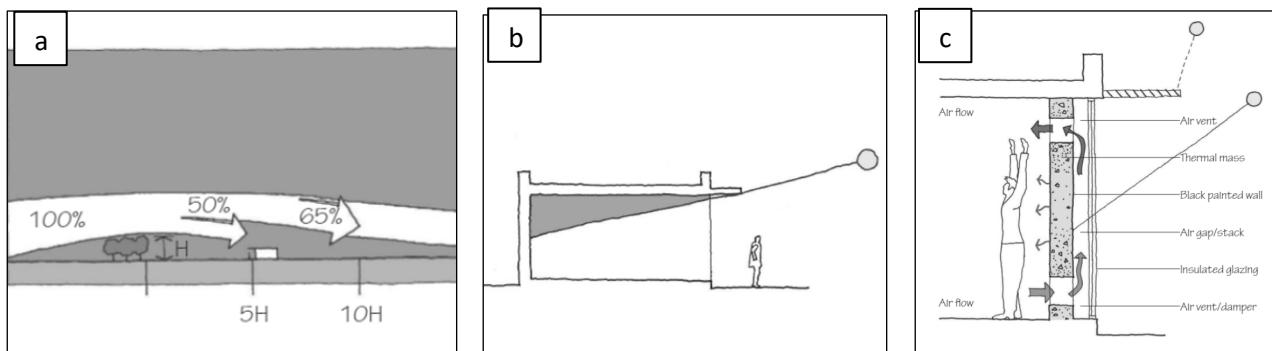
(a). A belt of trees that slow down wind, create more pleasant outdoor space, and reduce heating load (Heywood, 2021, p.23); (b). Overhang design to harness low winter sun (Heywood, 2021, p.15); (c). Trombe wall for heat storage (Heywood, 2021, p.121).
